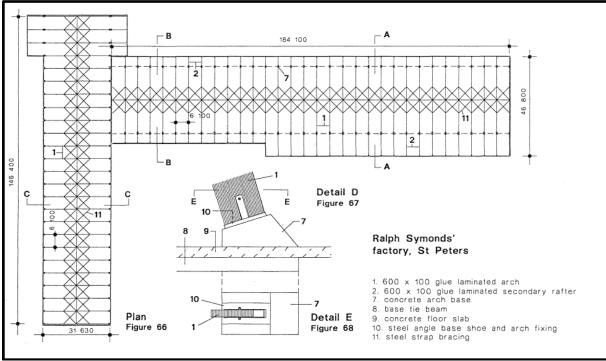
Plan of building 1994. Shows full extent of Holland Street arm (horizontal), which has since been shortened. (Source: Nolan, 1994).
